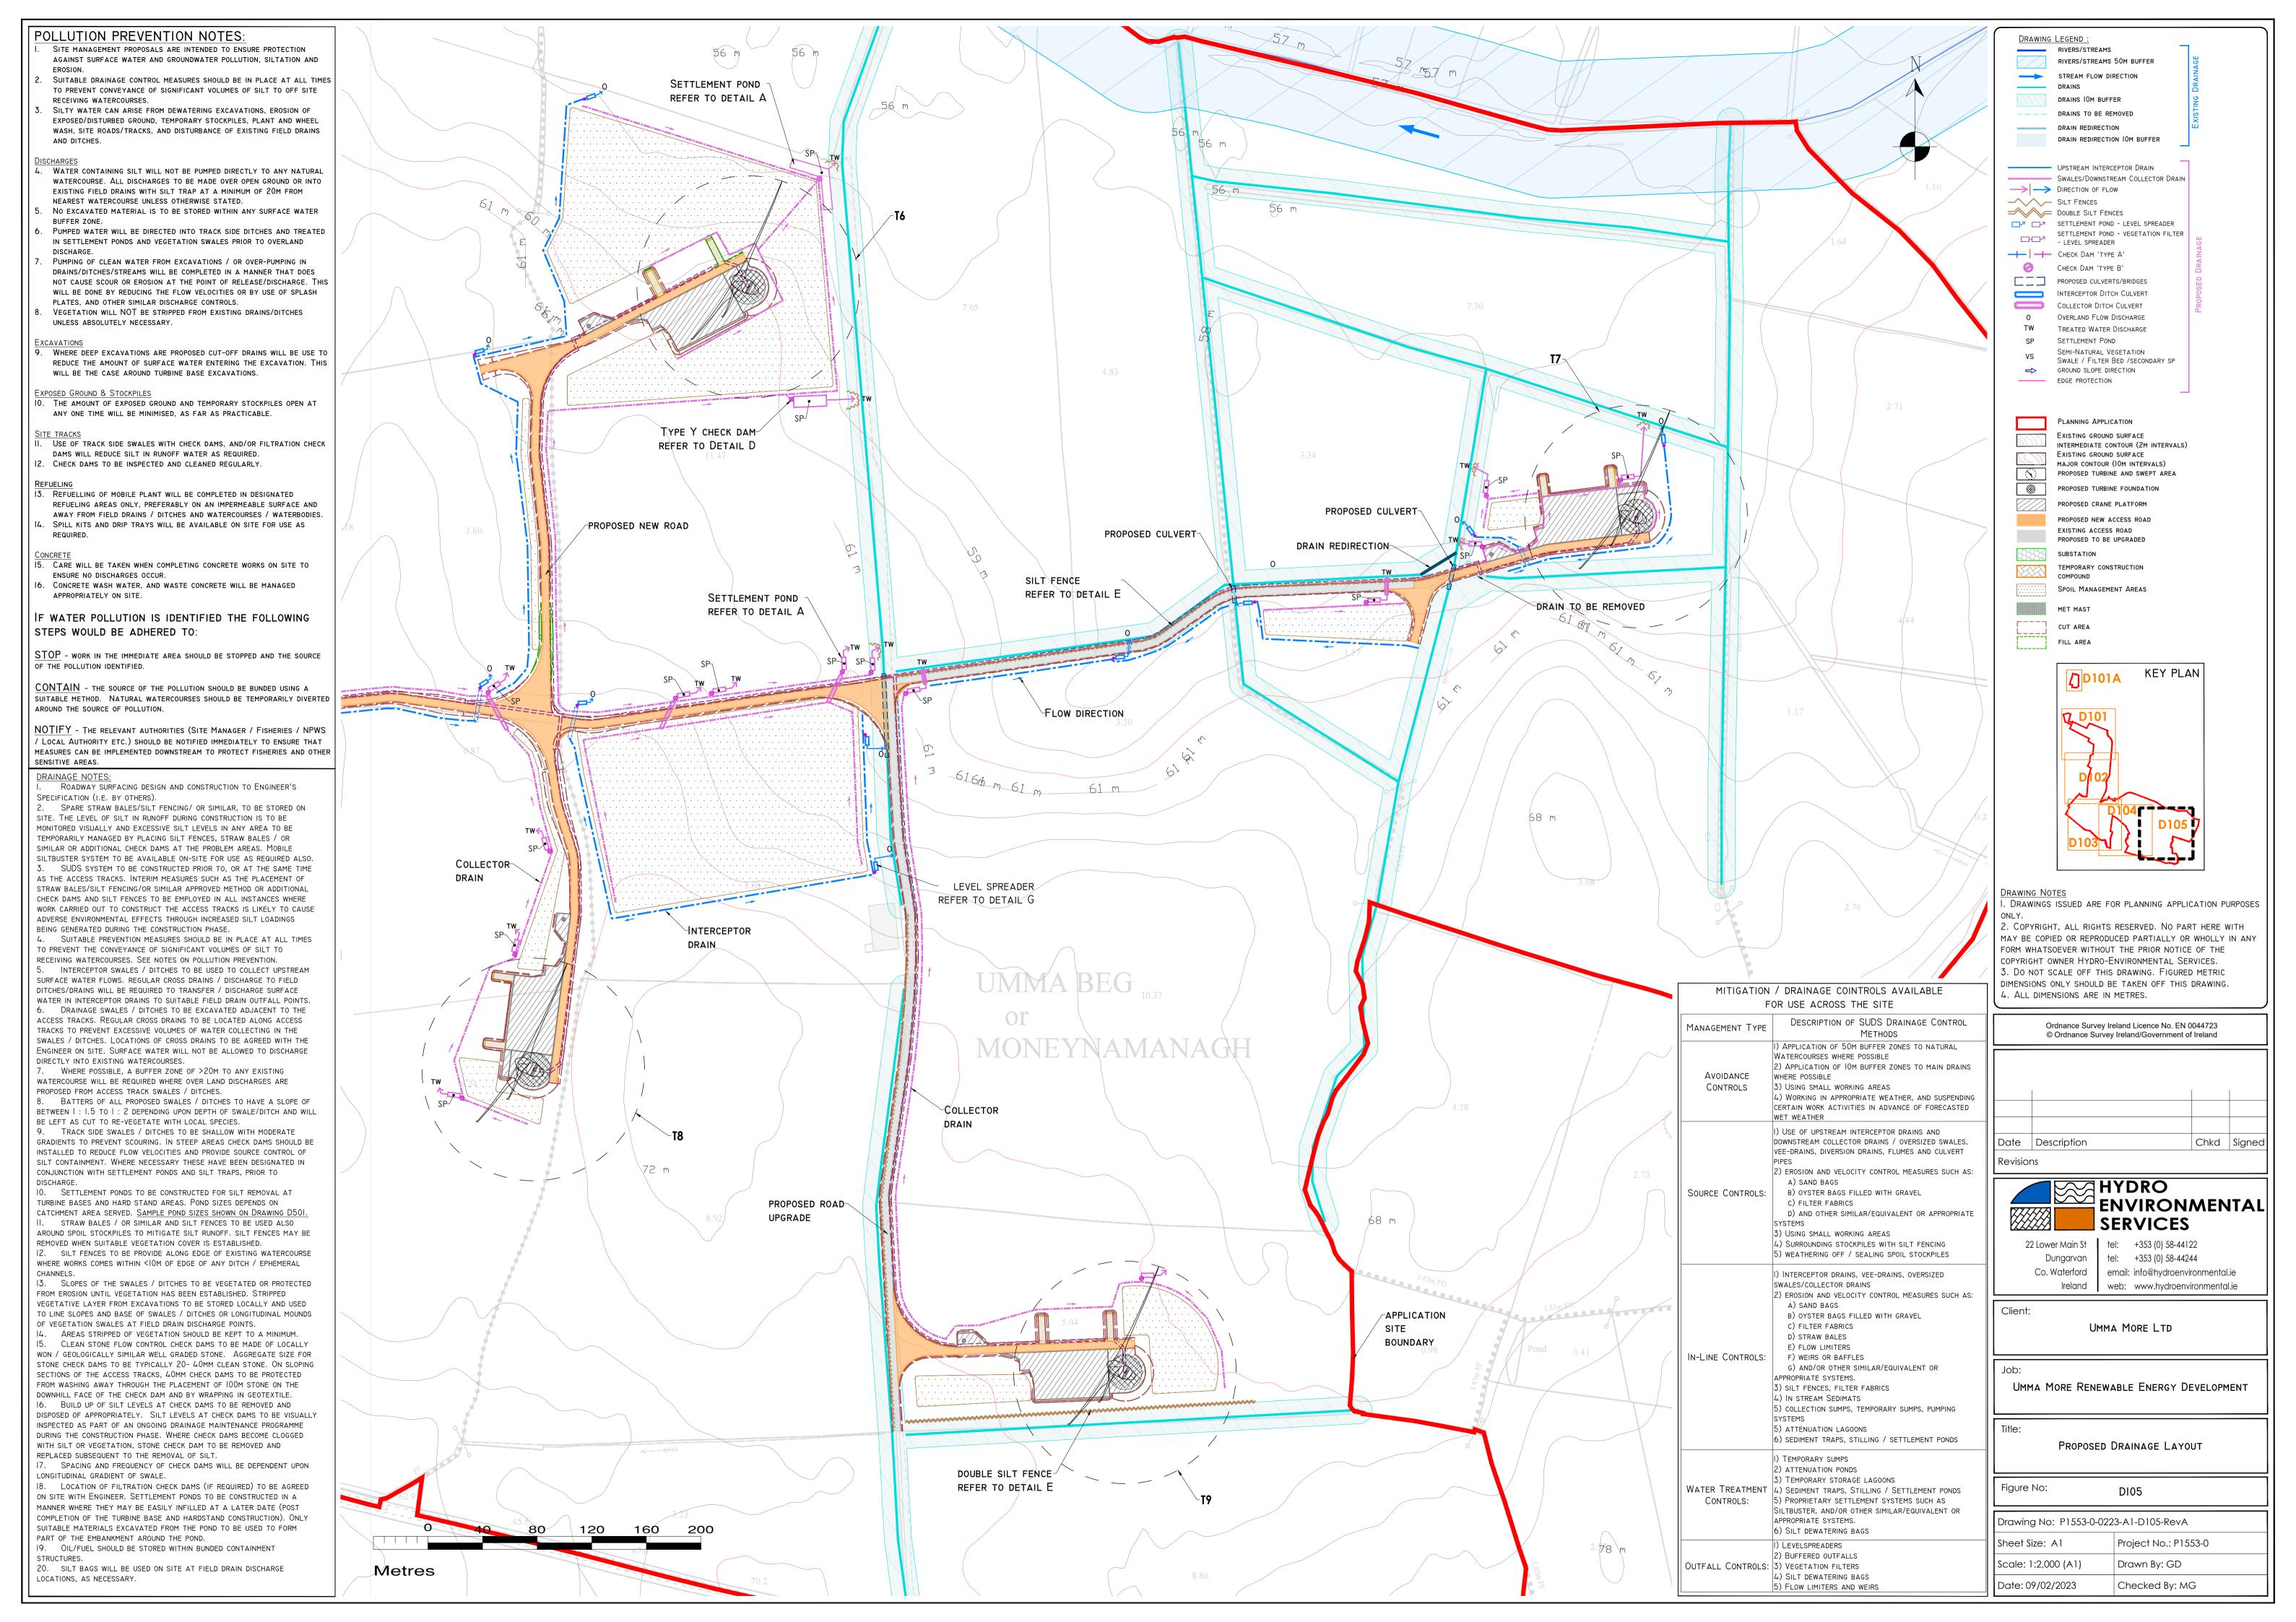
DETAILED DRAINAGE DESIGN / DRAINAGE DRAWINGS
